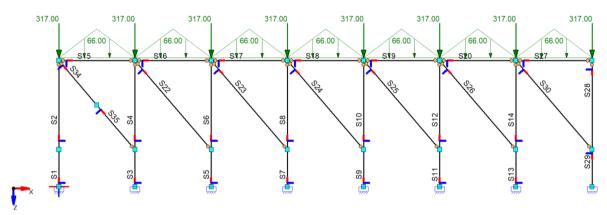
L3: Permanent load from the building and the deck plates. Units in kN and kN/m
